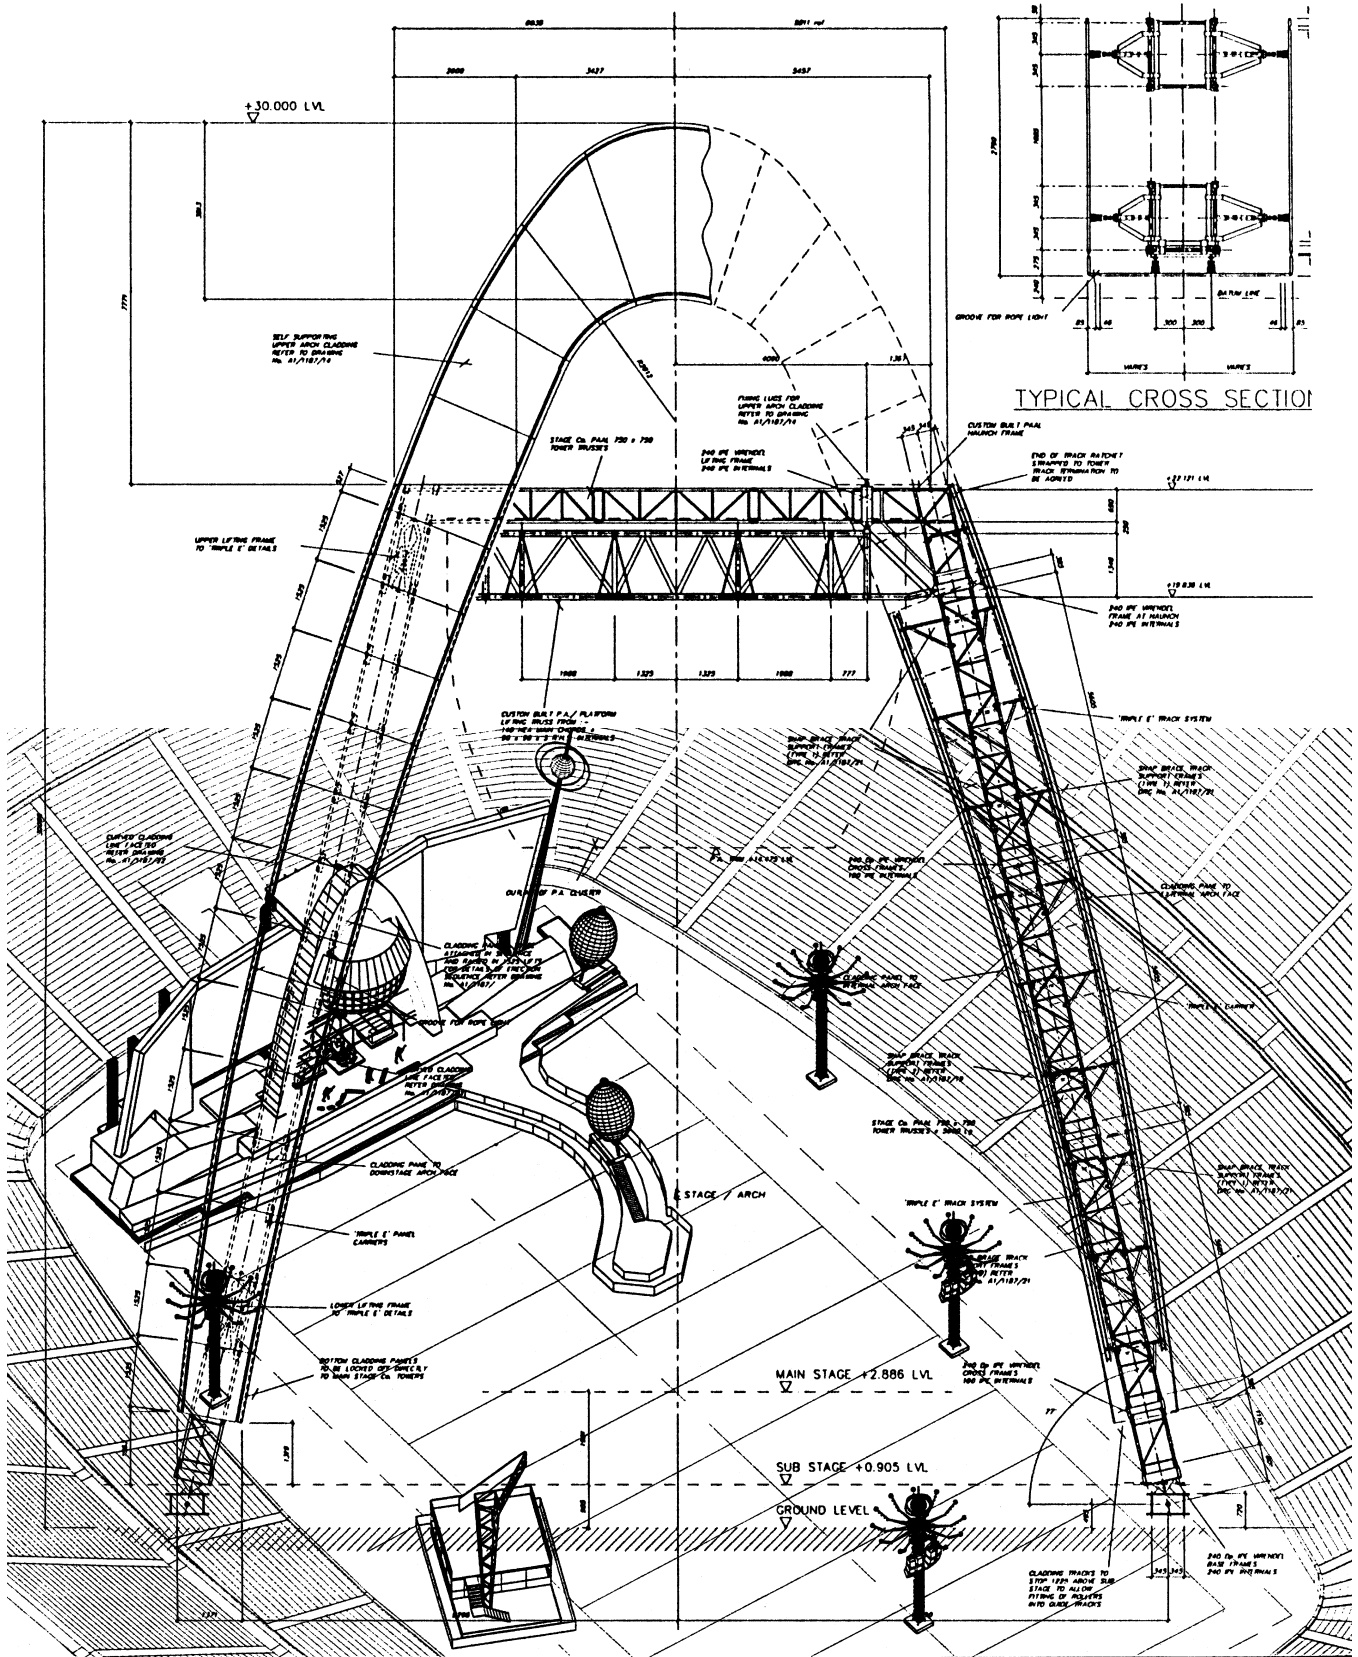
Main arch elevation/section HALF ELEVATION / SECTION THROUGH ARCH
